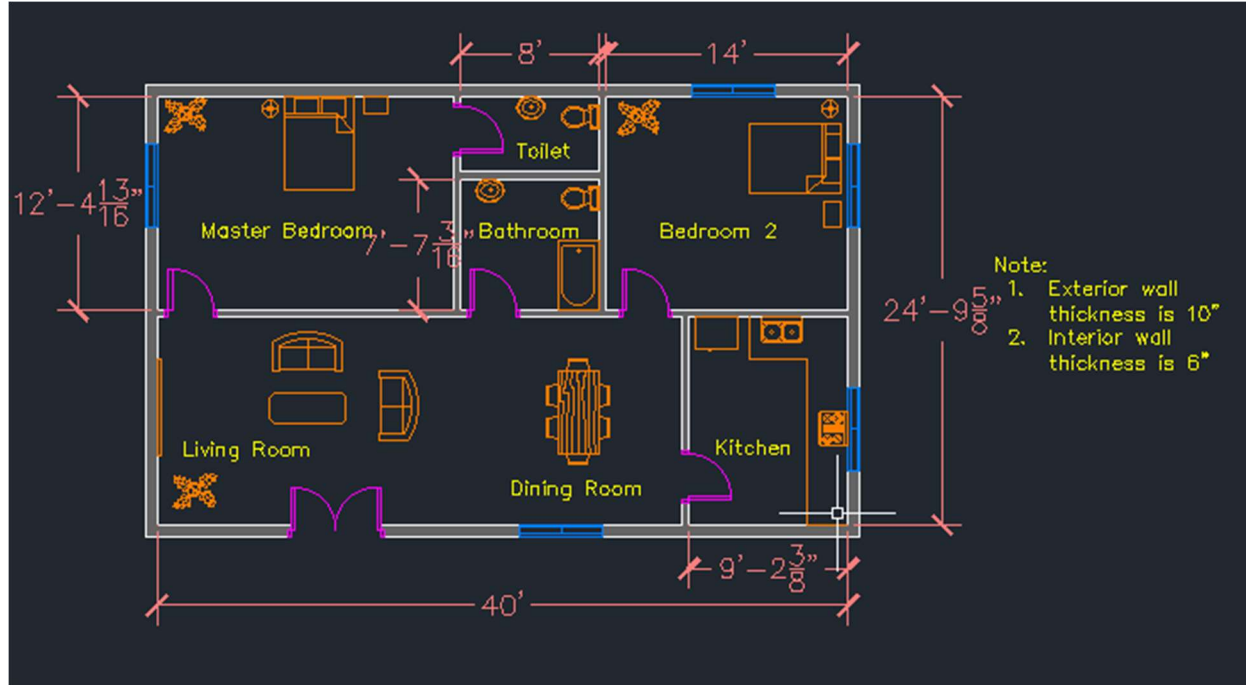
Typical Ugandan house plan (Credit: Nuwagaba)
